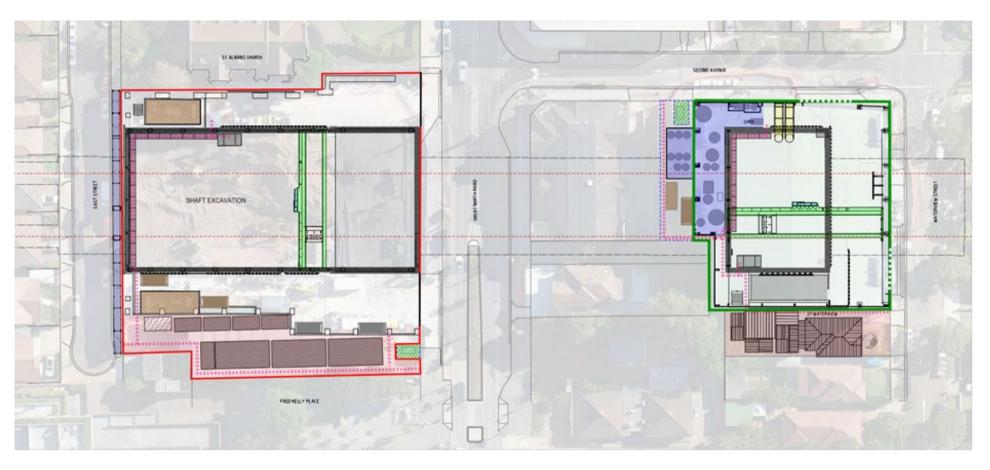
Five Dock east and west site layouts with acoustic shed shown in green.
